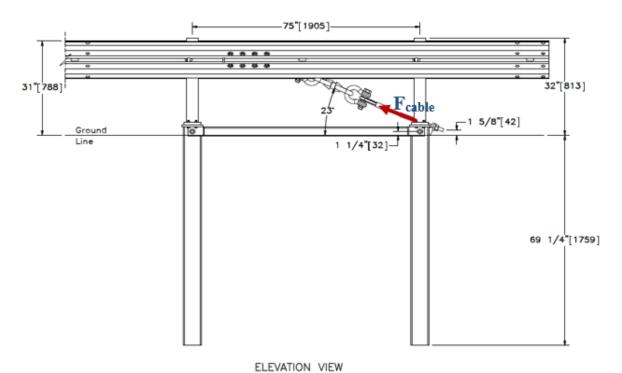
UBSP Downstream Anchorage Design Concept No. 3
